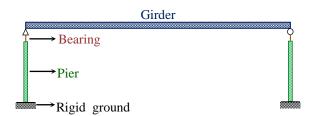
Sketch of a single-span simply-supported straight girder bridge
